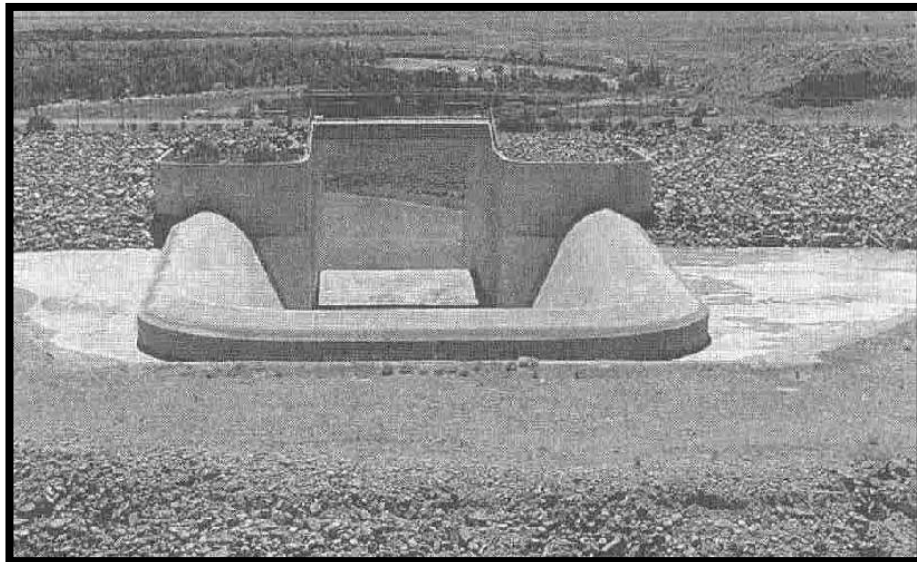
Bathtub spillway – Fontenelle dam, USA (Falvey, 2003)
